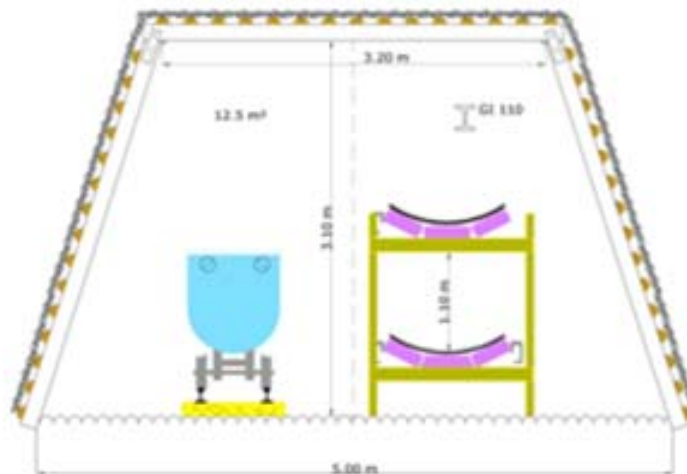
B. Cross – section of belt conveyor (trapeze support).
